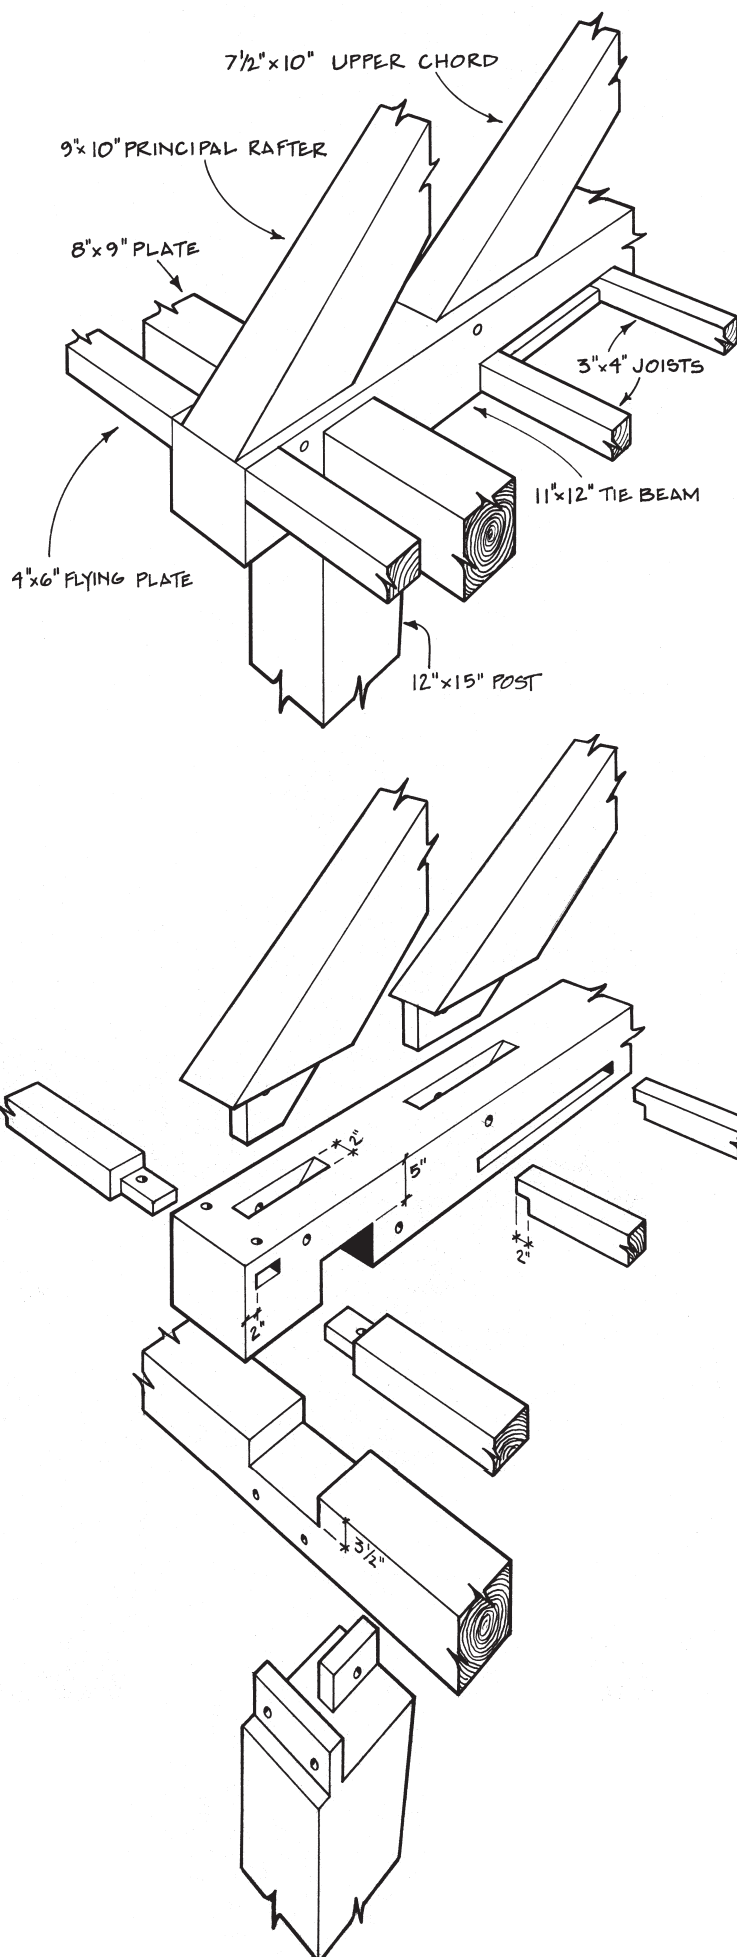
STRAFFORD MEETINGHOUSE, ASSEMBLED AND EXPLODED VIEWS OF TYING JOINT WITH UPPER CHORD SEATS.
